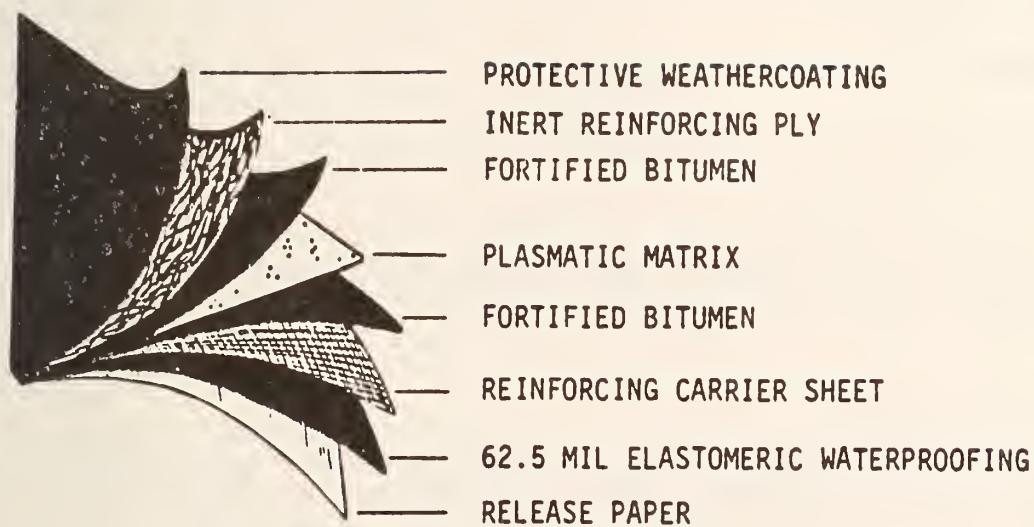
TYPICAL PREFORMED MULTI-LAYERED BOARD
